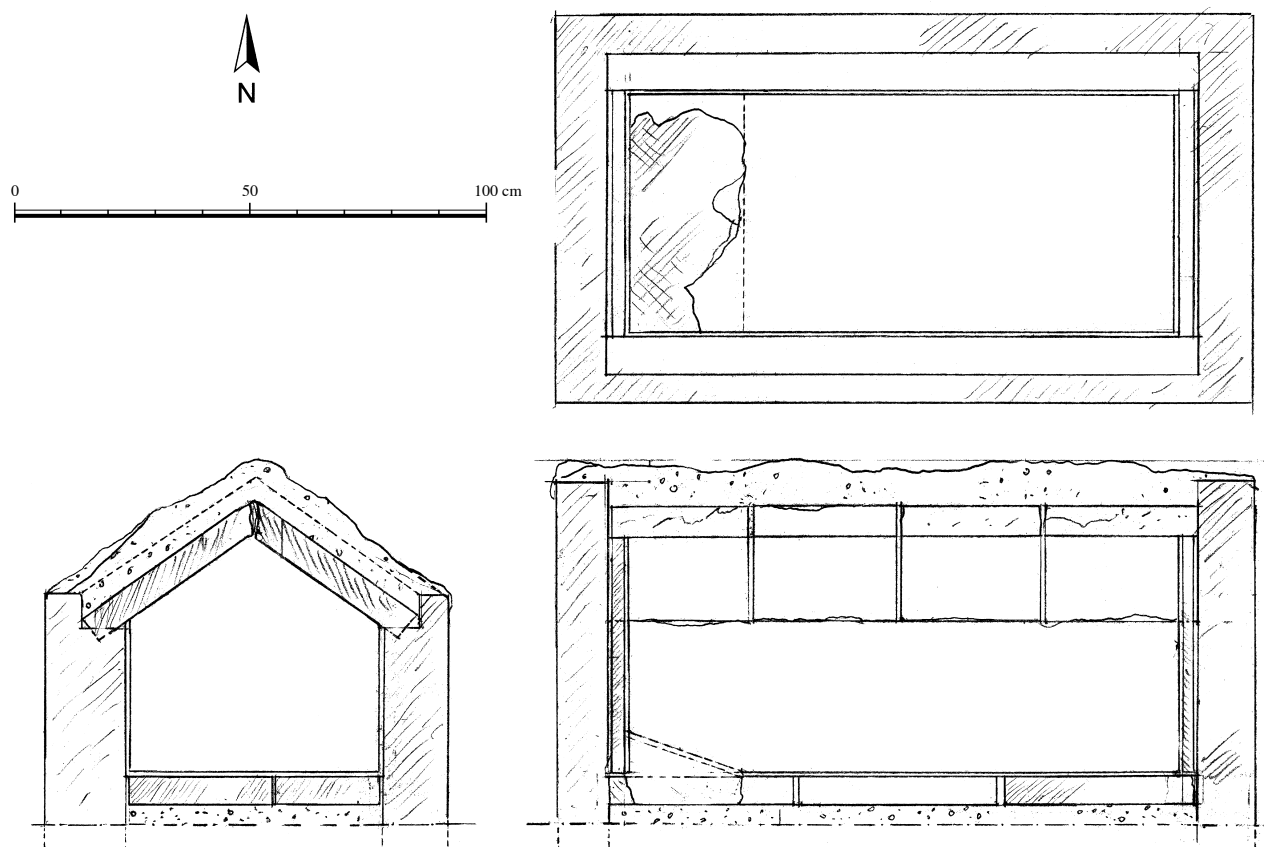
Tomb in Mike Antića Street, transversal cross-section, ground-plan and longitudinal cross-section (plan by M. Jeremić)
